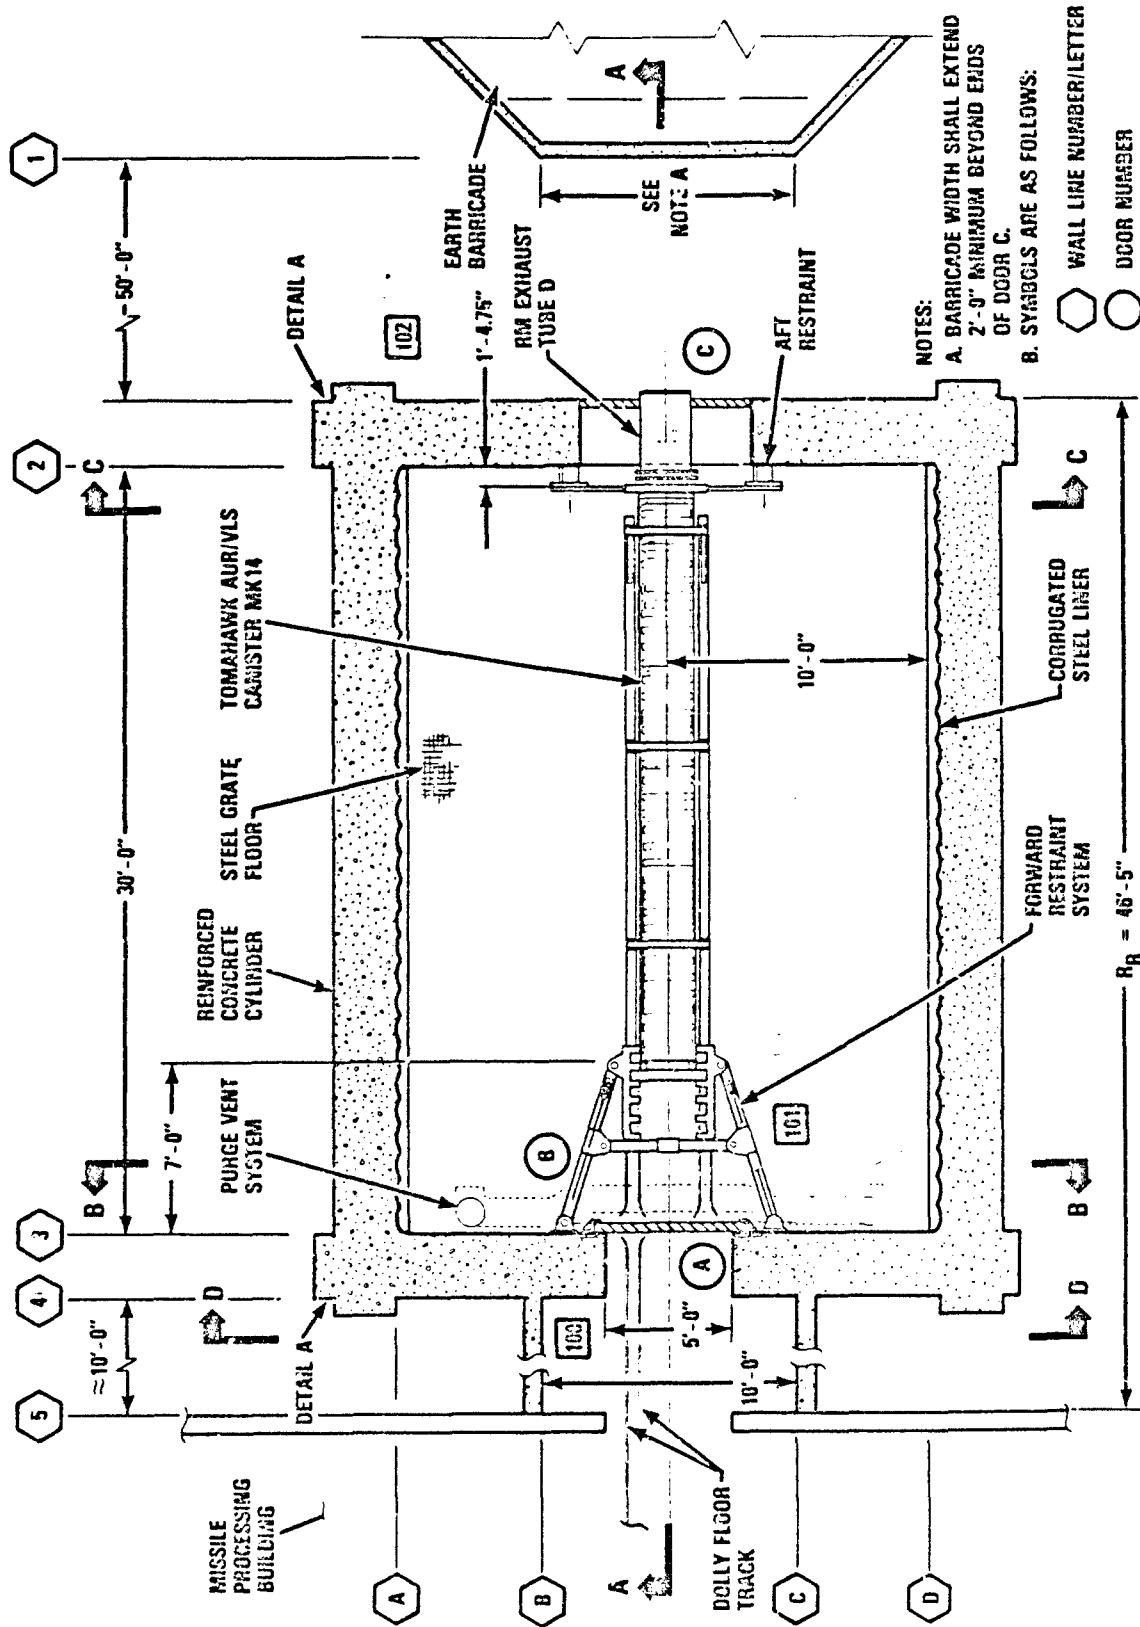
Floor plan for NAVFAC Type VB missile test cell.
